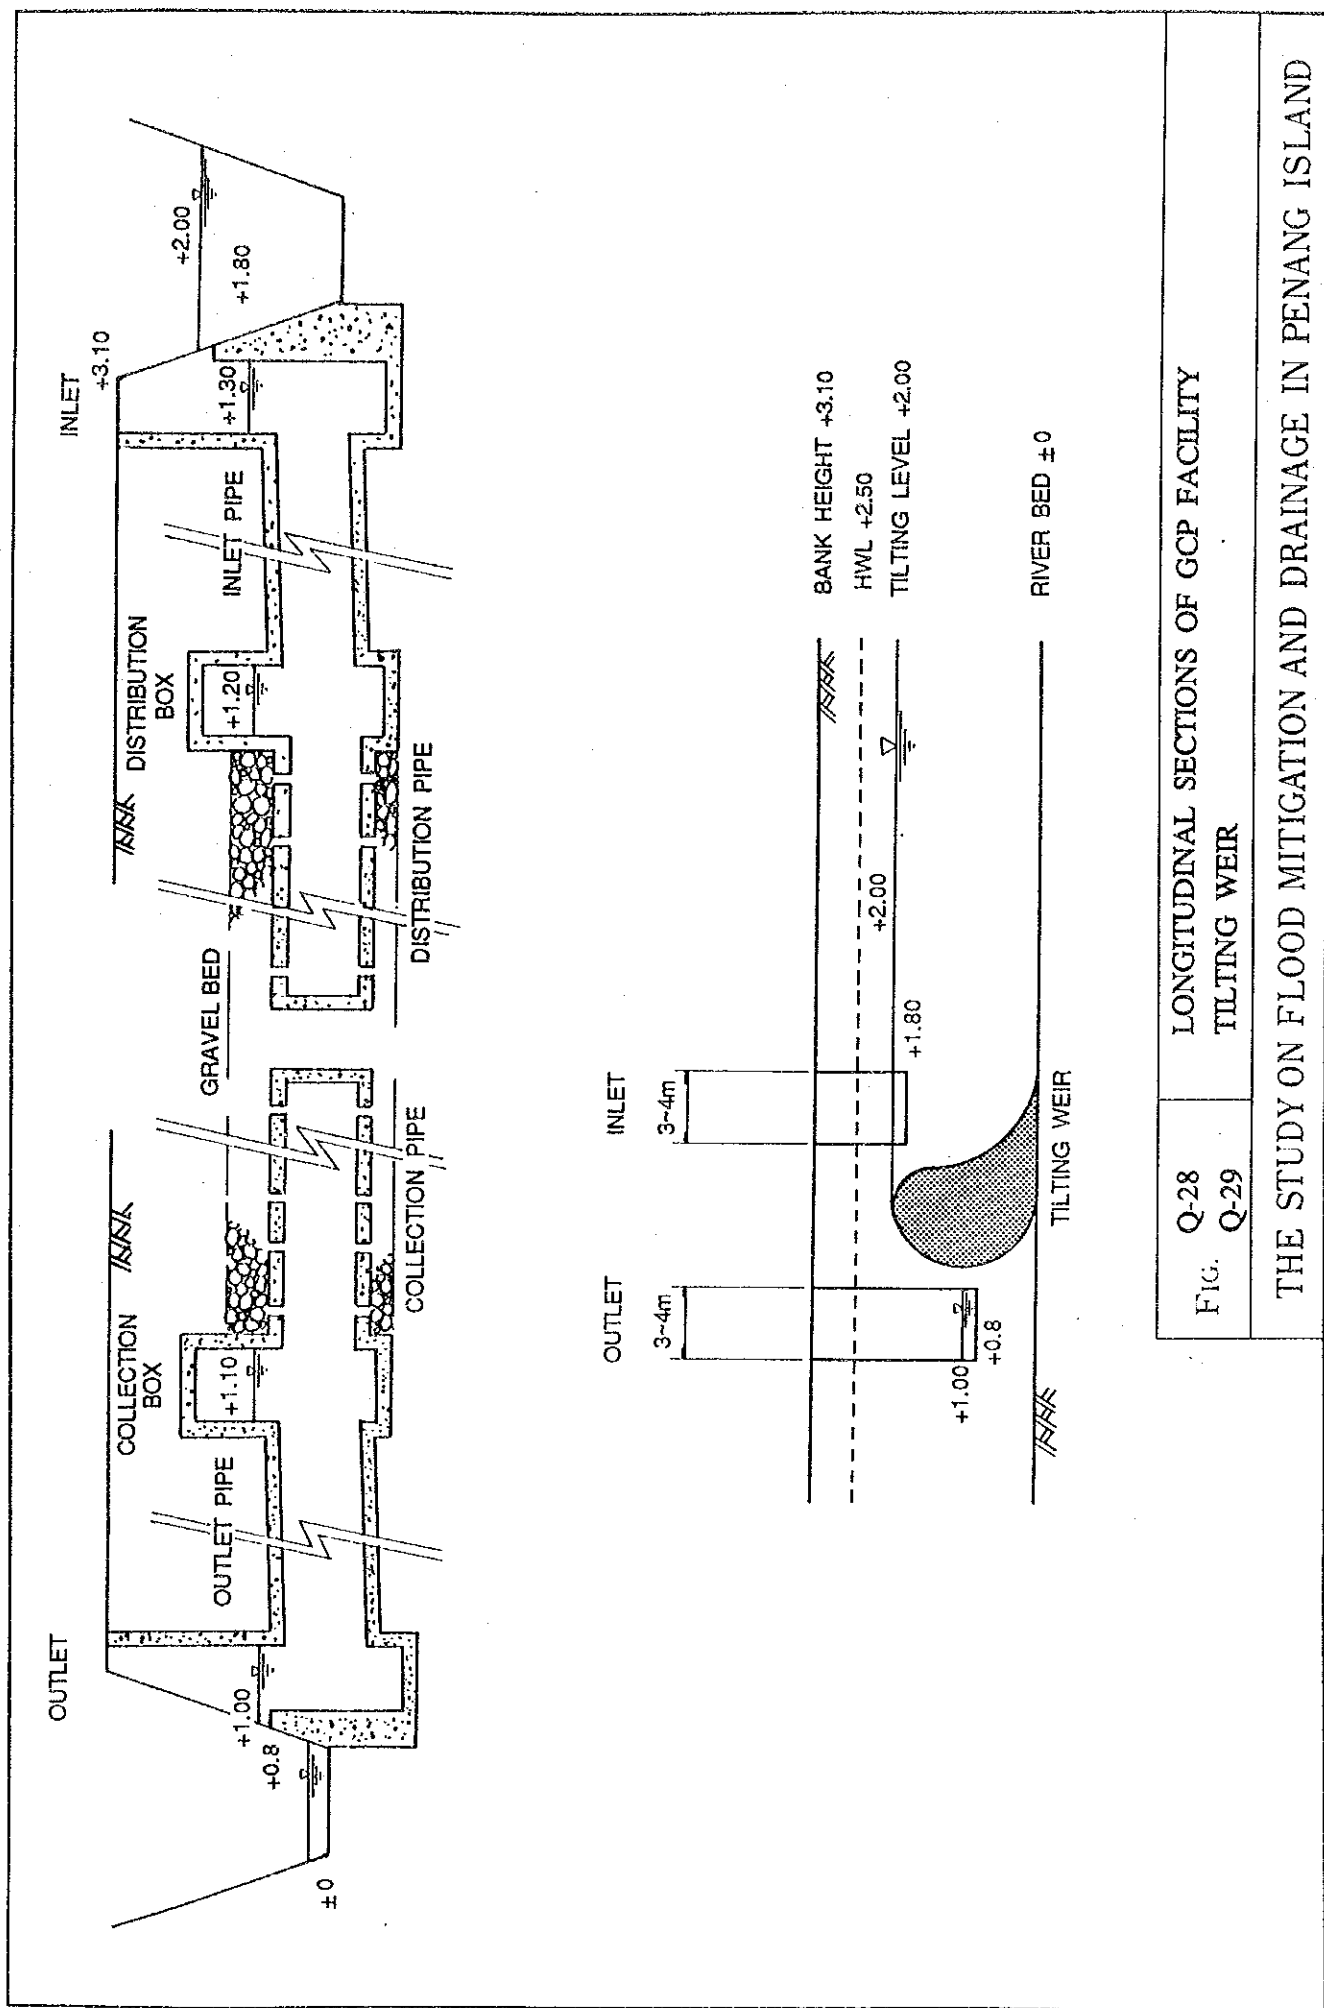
LONGITUDINAL SECTIONS OF GCP FACILITY
